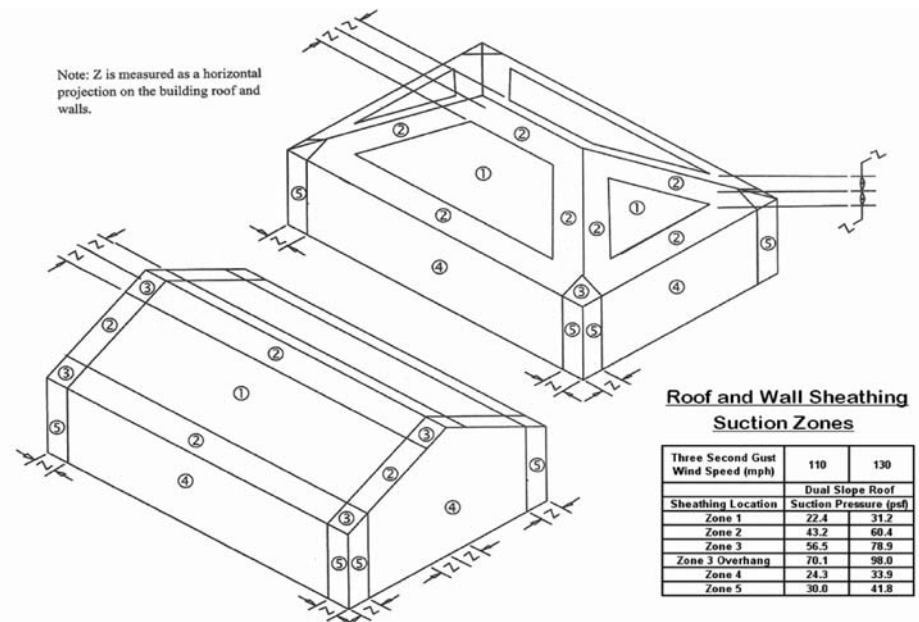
Roof and wall sheathing design wind pressure (suction) zones (ASCE-7)
